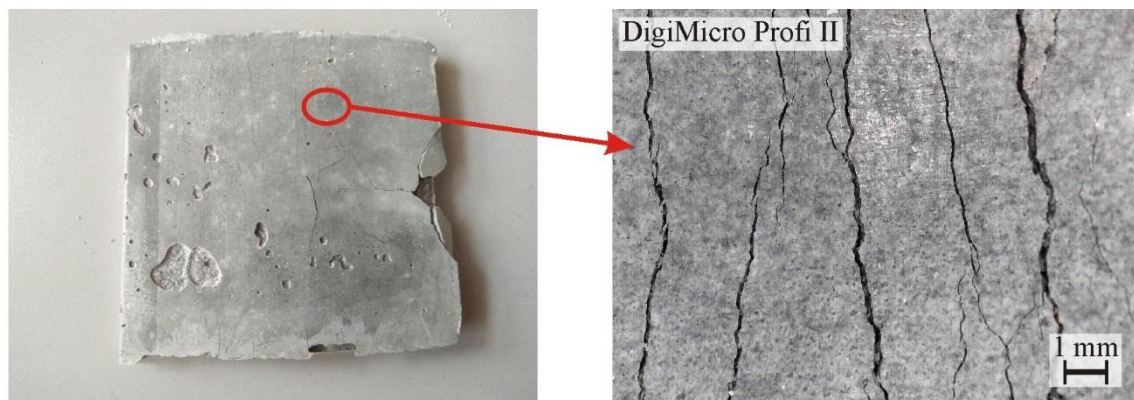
Cracks in the TRC test specimen, width of the cracks is about 0.04 – 0.15 mm.
